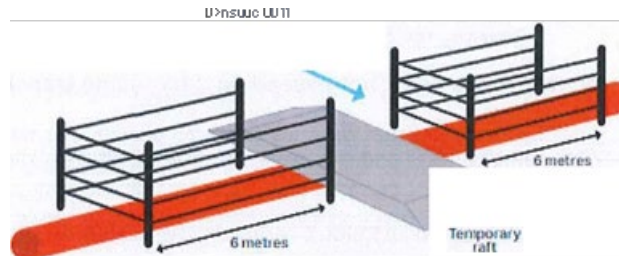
construction traffic crossing points (Medium Pressure / Low Pressure)
